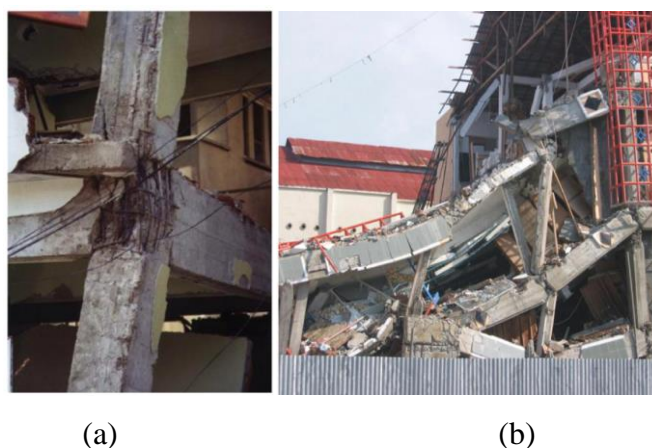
(a) Beam-Column Joint Failure and (b) Strong Beam-Weak Column Failure (Saatcioglu, 2013).
